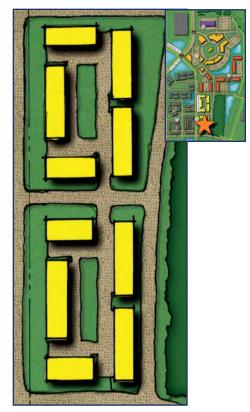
Station Area Plan - 'Townhome Commons The architectural guidelines of District 3 apply to the buildings highlighted in yellow.
